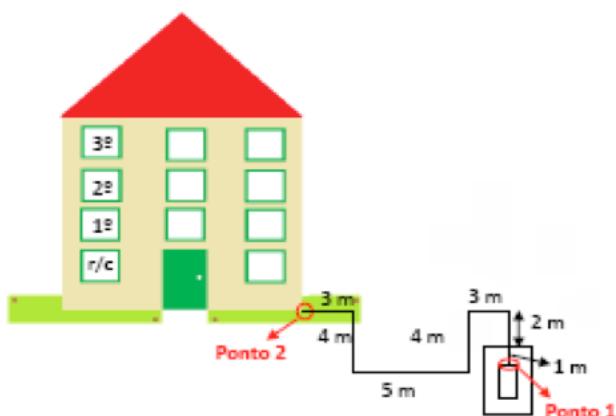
Scheme of a water supply system: from a well with a submersible centrifugal pump to a building with 4 floors and 25 houses (Martins, and Azevedo, 2014)
